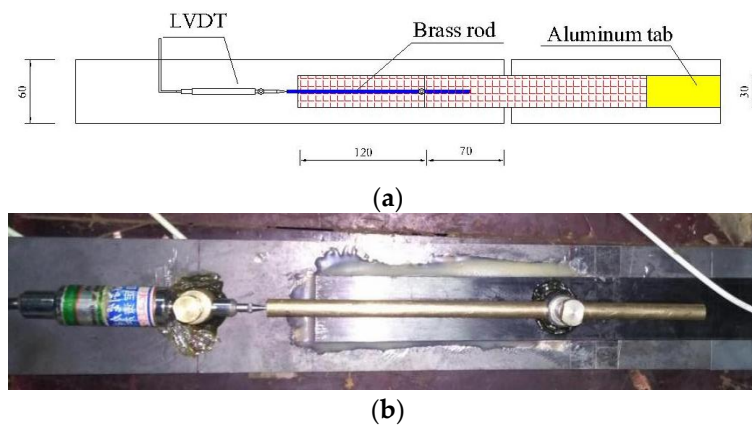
The arrangement of the LVDT in CFRP/steel double strap joint: (a) schema; (b) photograph (unit: mm).
